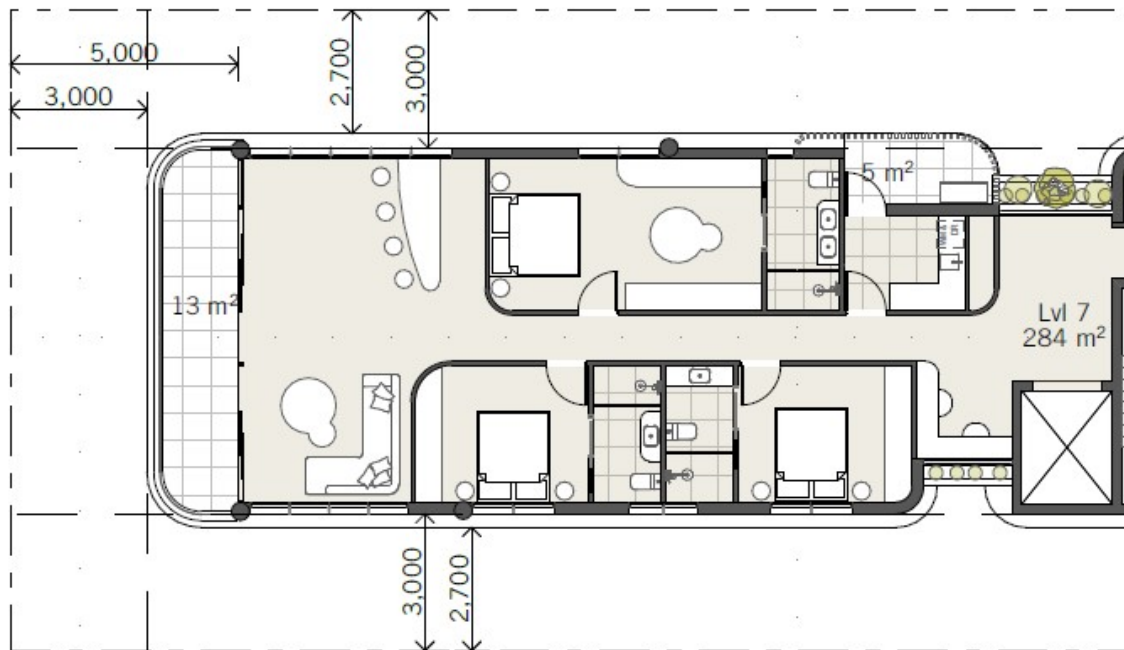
Partial level 7 floor plan (Source: Lightwave Architecture)
